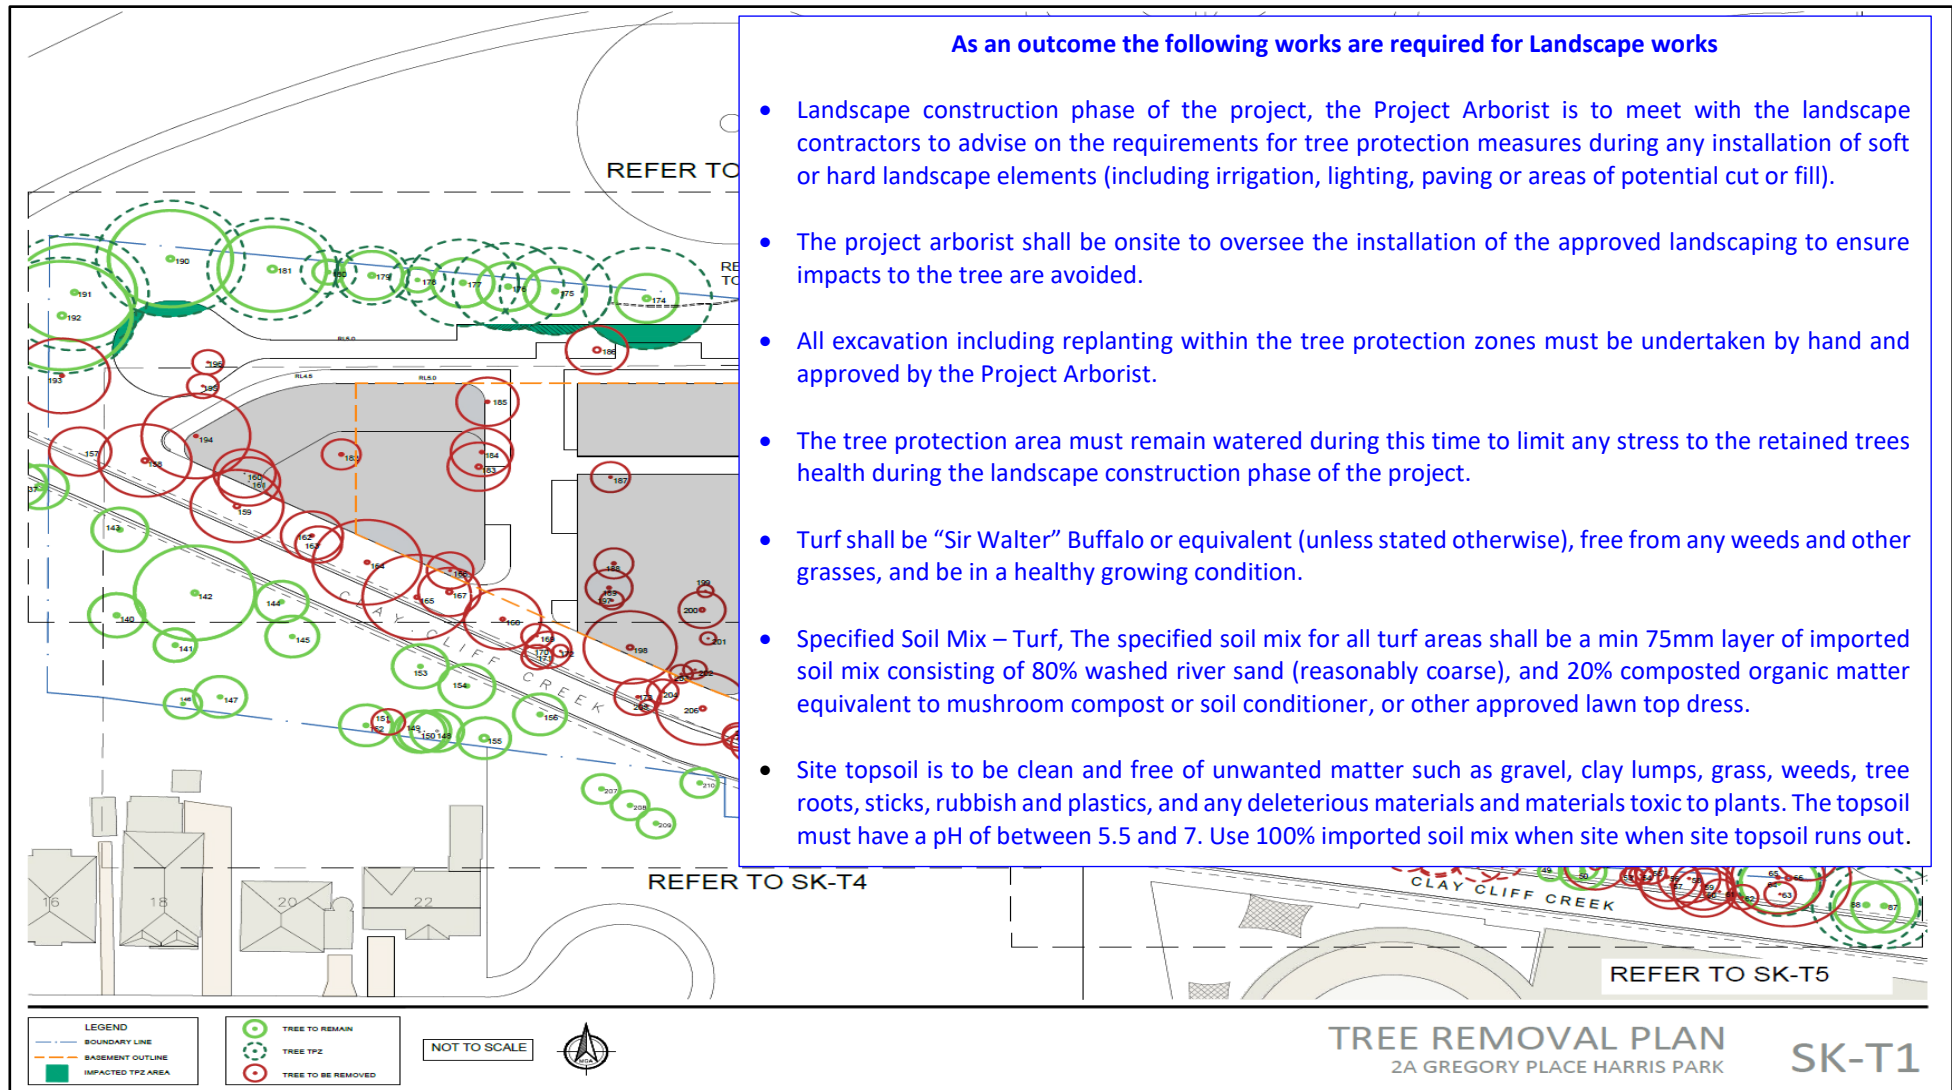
Shows site and adjoining tree protection measures regarding Landscape Stage protection.
